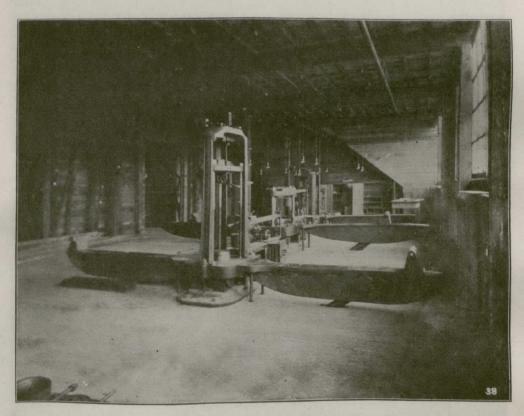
THREE CONCRETE-BEAM TESTING MACHINES.
